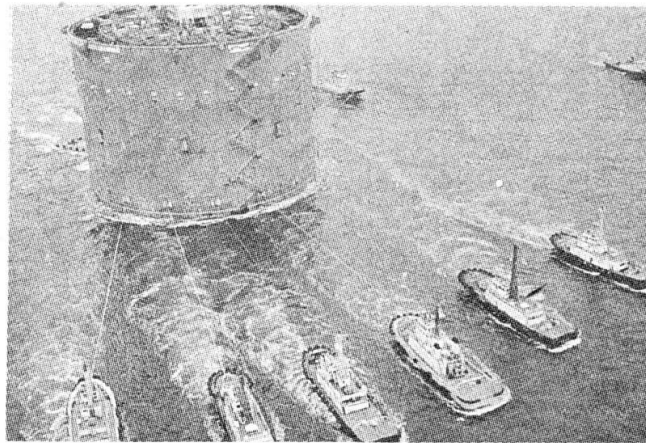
Laying-down Caisson Method (Towing Steel Caisson of 2P)
